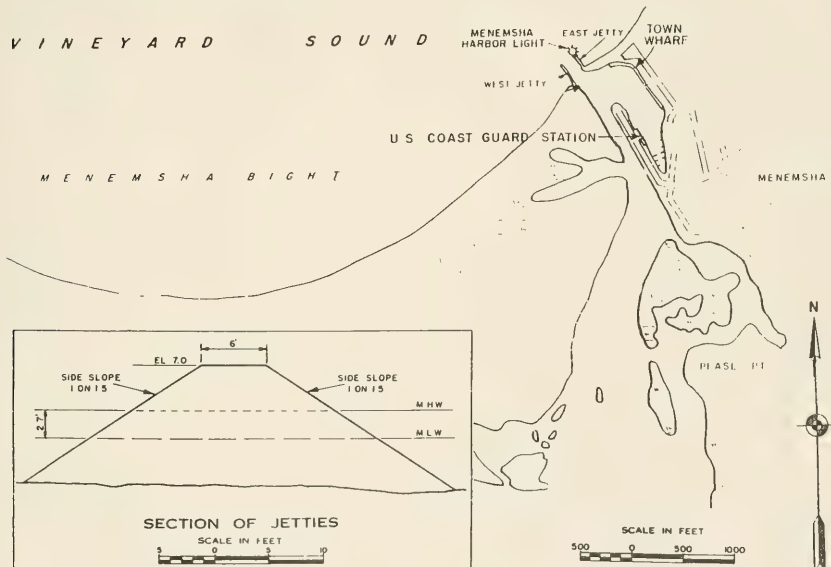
Plan view and typical section of Menemsha Creek jetties, Martha's Vineyard, Mass.
